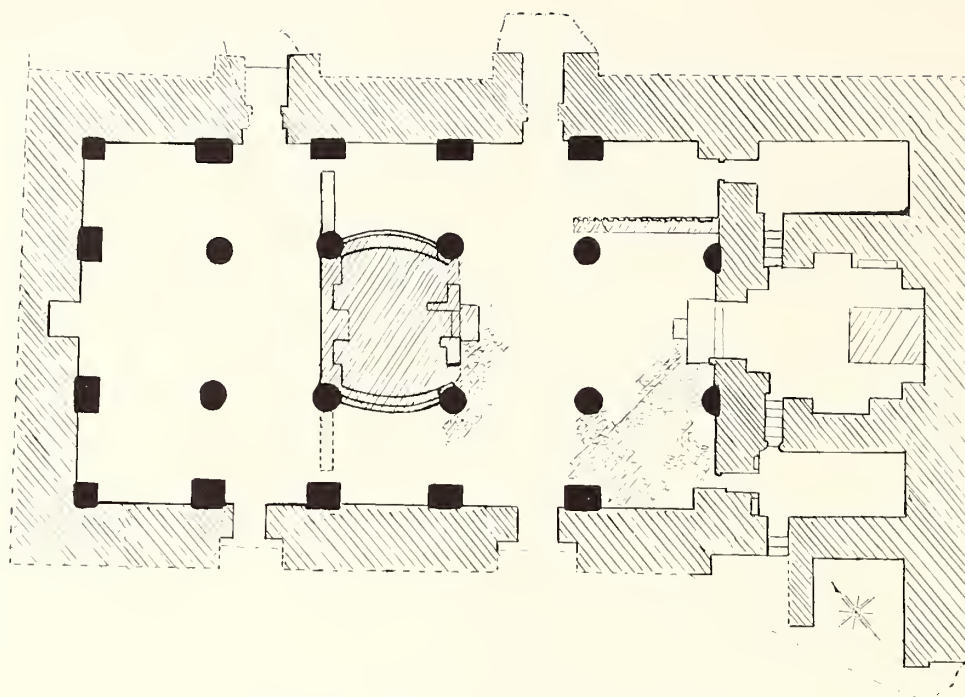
HĪRA, PLAN OF CHURCH, MOUND XI
